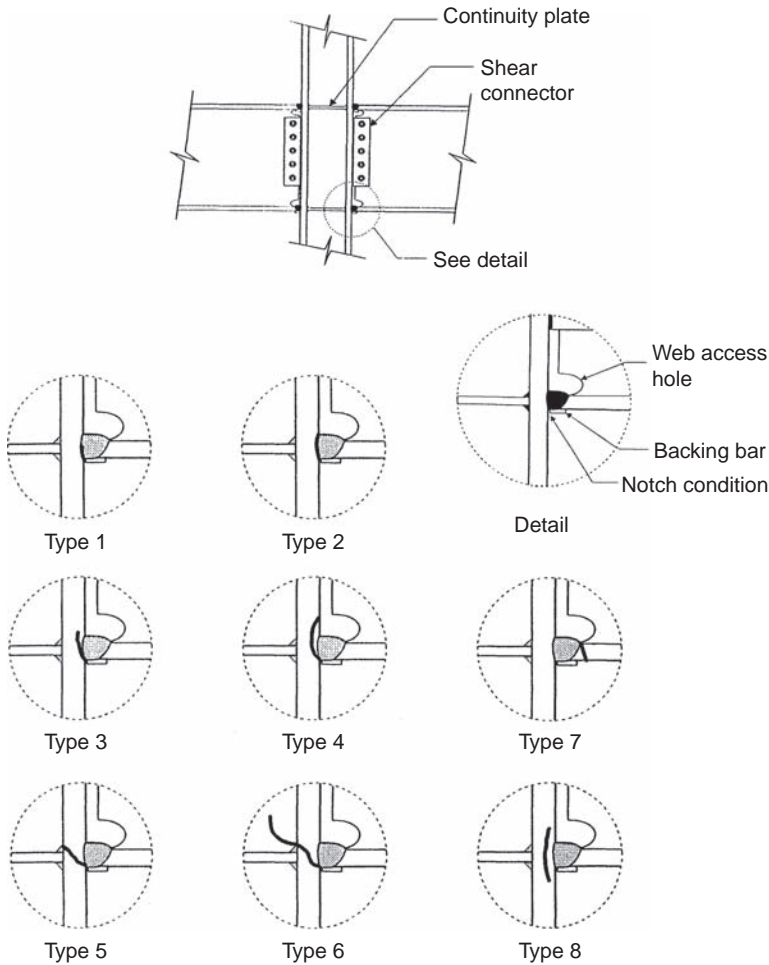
Typical welded flange and bolted web beam-to-column connection in moment-resisting frames, with close-up view of notch condition at backing bar, and eight types of reported Northridge fractures. (Courtesy of R. Tremblay, Dept. of Civil Engineering, Ecole Polytechnique, Montreal, Canada.)
